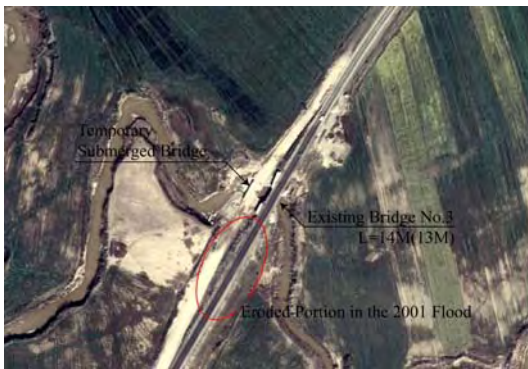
Satellite Image of Existing Bridge No.3 (14 Metry Bridge)
